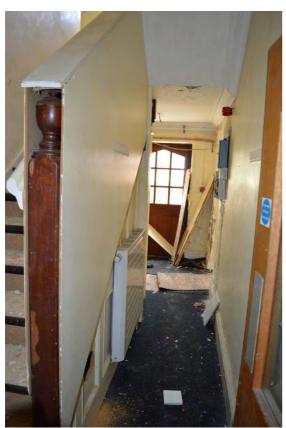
Building 9, ground floor, secondary hallway and stair detail, facing east (7335_0143)
